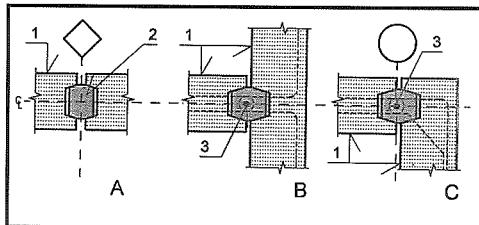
Load Bearing Wall-Loading Bearing Wall
